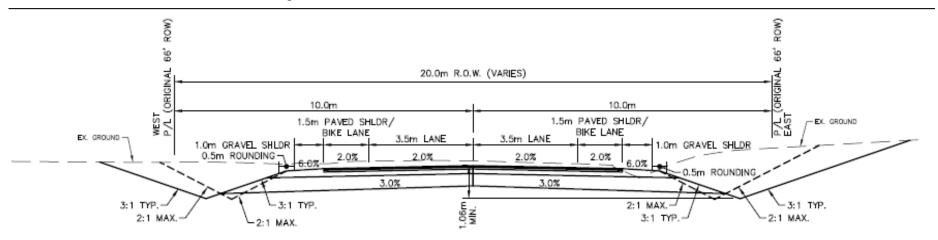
Alternative 3 Full Reconstruction 20m ROW
